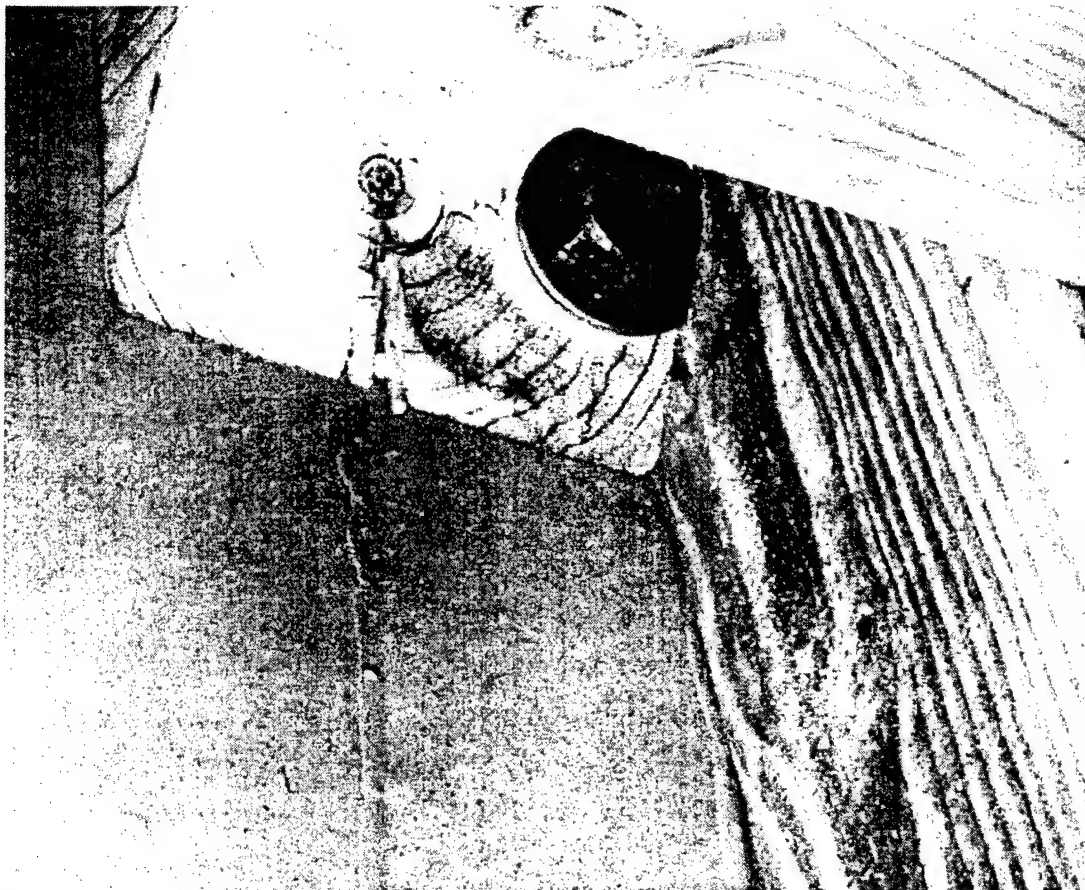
Leaks on the downstream face where a coil-tie bolt penetrates the formwork.
